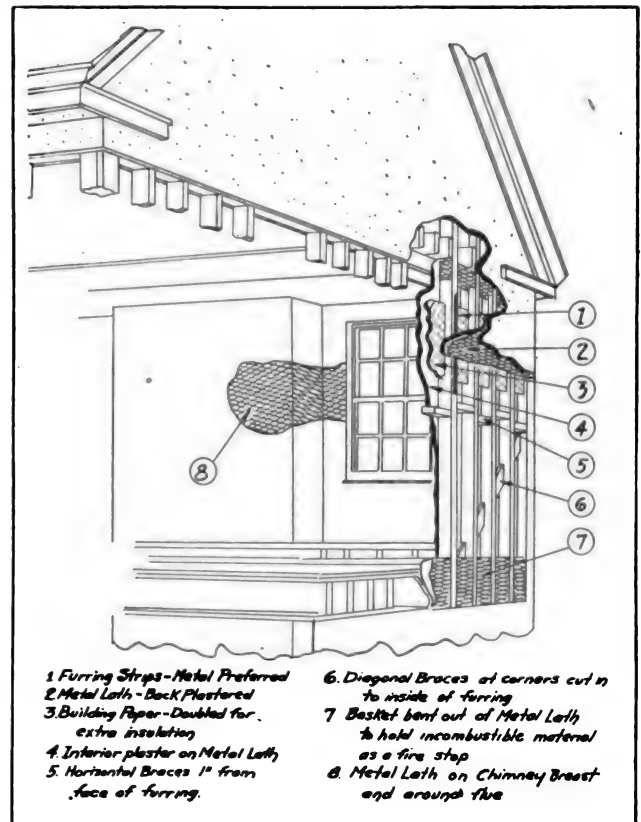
BACK PLASTERED METAL LATH CONSTRUCTION
